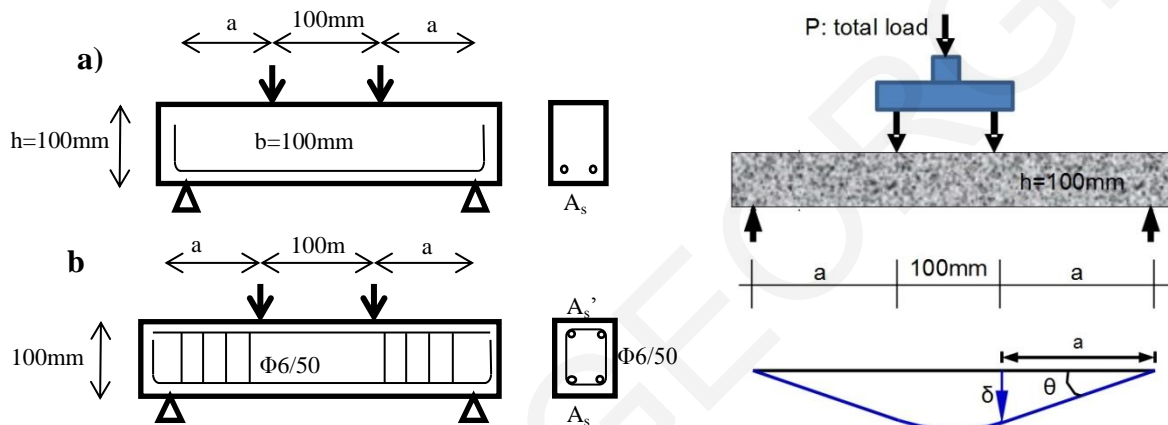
Test configuration for four point bending and reinforcement details for (a) beams with flexural reinforcement placed so as to increase the magnitude of shear demand in the beam shear spans, (b) beams reinforced with longitudinal bars and stirrups for shear strength and (c) Definition of specimen rotation  $\theta$  in the shear span (reference to rotation capacity)
